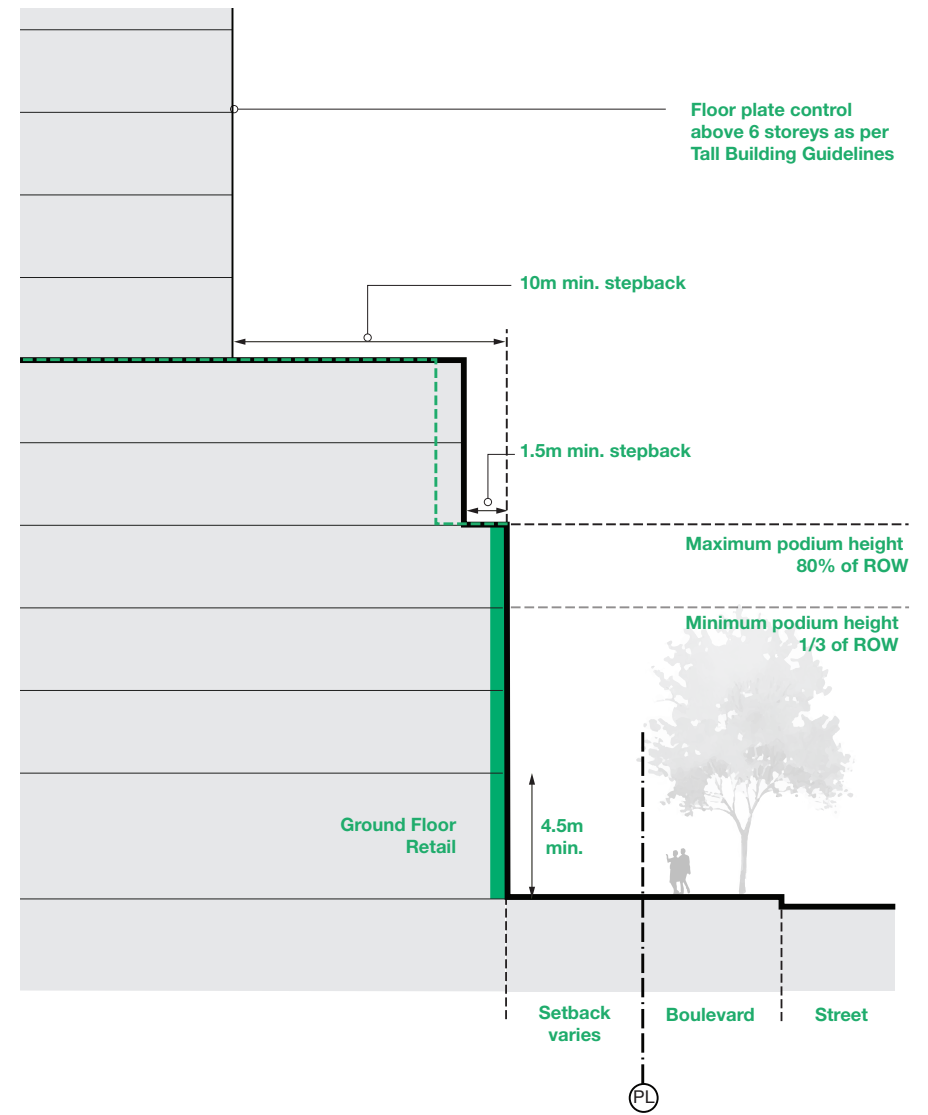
Tall Building Setback: Main Street East, Ontario Street South and Thompson Road South
